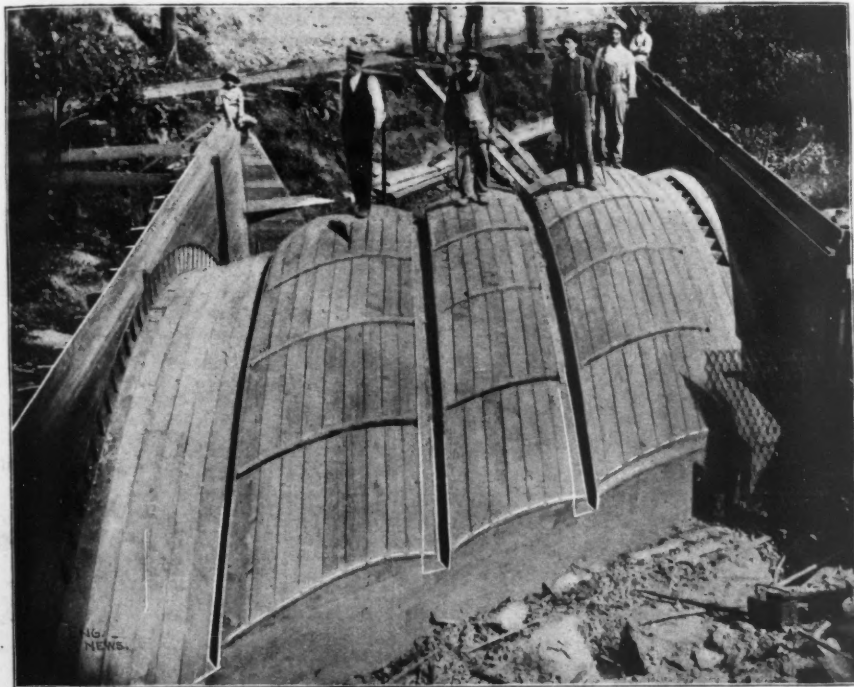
MOLD AND CENTERING FOR MELBER CONCRETE ARCH BRIDGE.
